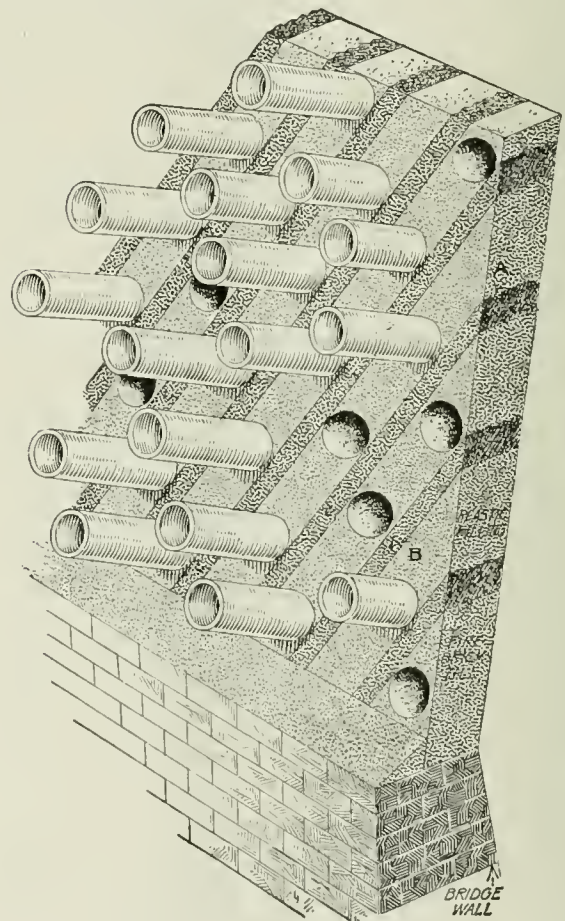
DETAILS OF BAFFLE-WALL CONSTRUCTION
